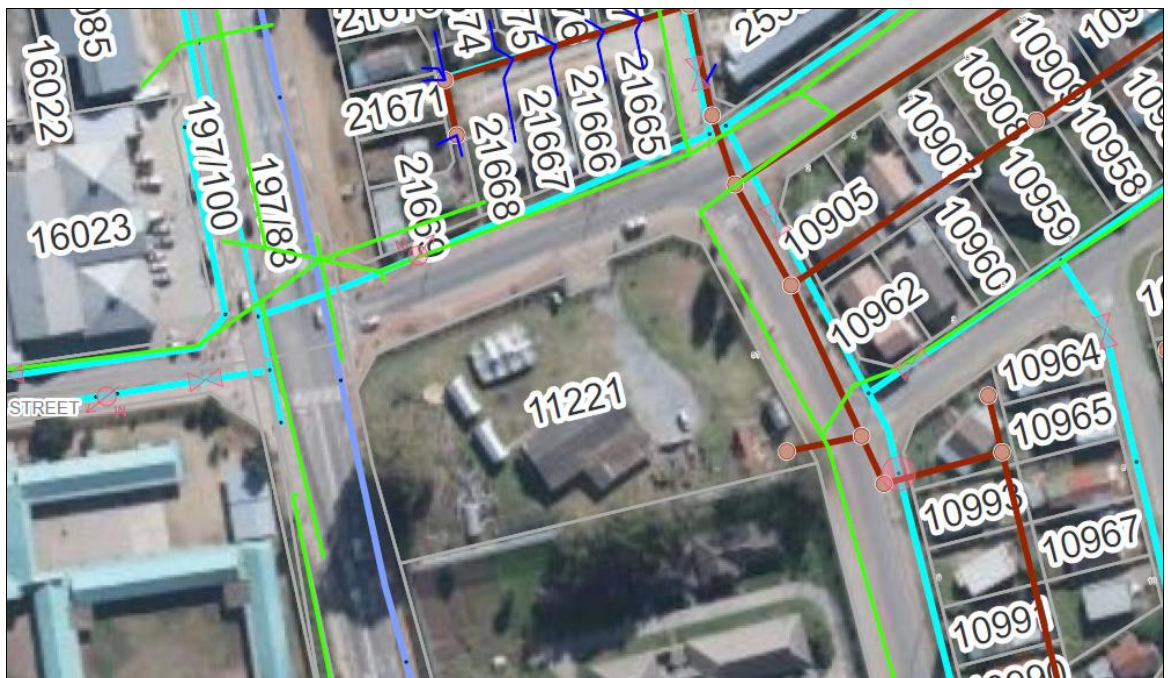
Existing sewer line and erf connection servicing the site (brown line)
